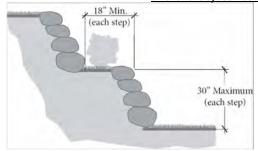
B.1: Allowable terrace configuration for wall or rockery adjacent to a public sidewalk. Note that this illustration shows a stone wall but other masonry and concrete walls are acceptable as well.
